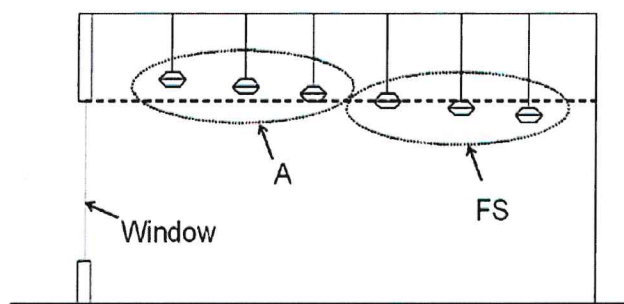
Figure A: Elevation view showing an application of indoor lighting, labeled 'FS,' which is subject to these requirements and indoor lighting, labeled 'A,' which is installed so that it is typically not subject to these requirements. However, if the structure is elevated such that the luminaries labeled 'A' are visible from another property then, they are also subject to these requirements.
